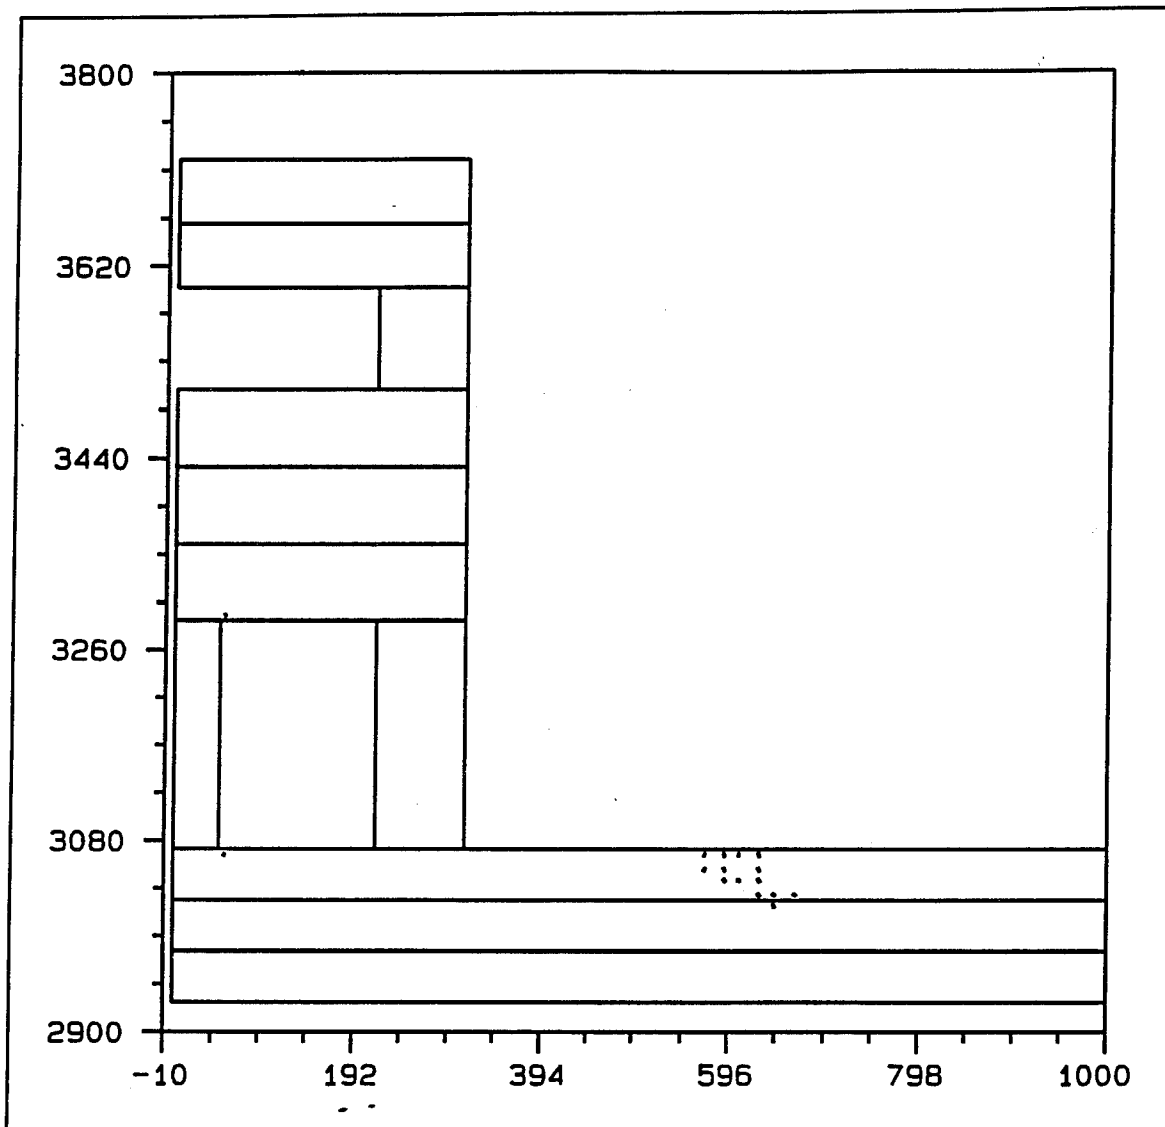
Crack pattern at day 163 of the center wall half of the monolith
